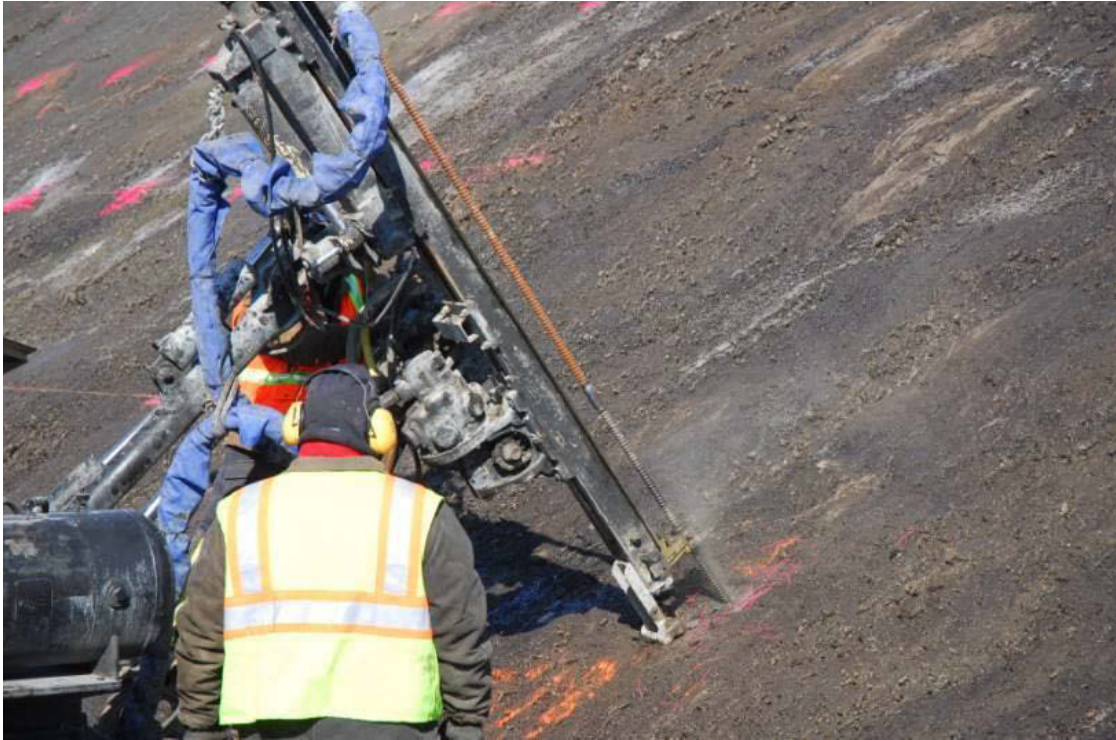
Cut slope at Dalton Highway 9 Mile Hill construction project location
